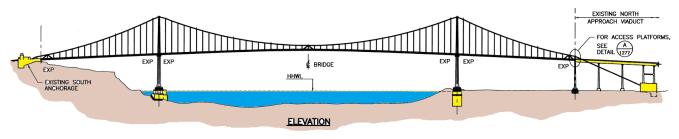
Lions Gate Bridge Suspended Spans Elevation.
